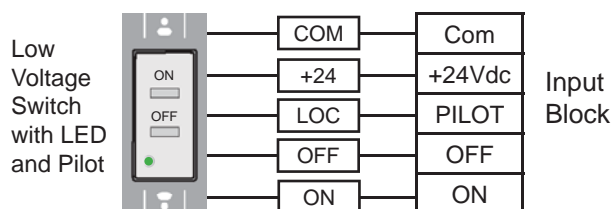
Typical LV Switch 2 Btn ON/OFF w. Locator Connections
